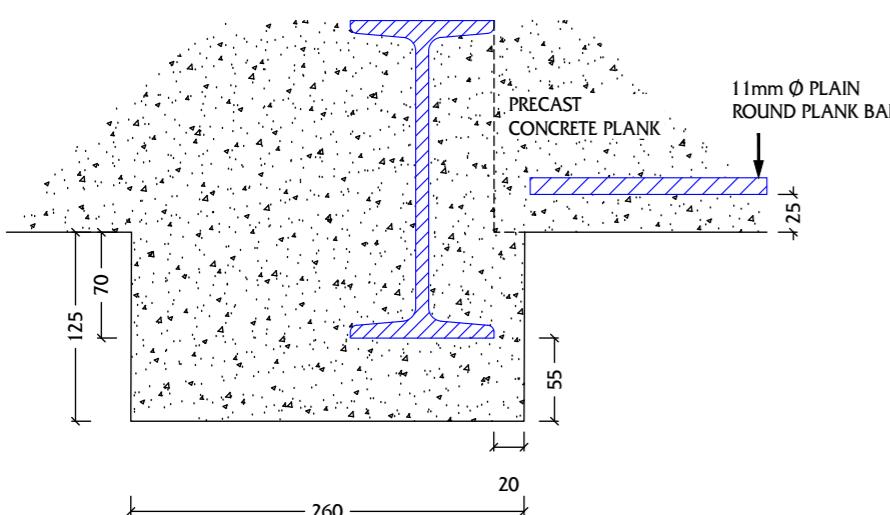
PART SECTION LOOKING WEST THROUGH 1ST FLOOR PRIMARY BEAM - SURVEY AREA Q/11-12 SCALE 1:5
